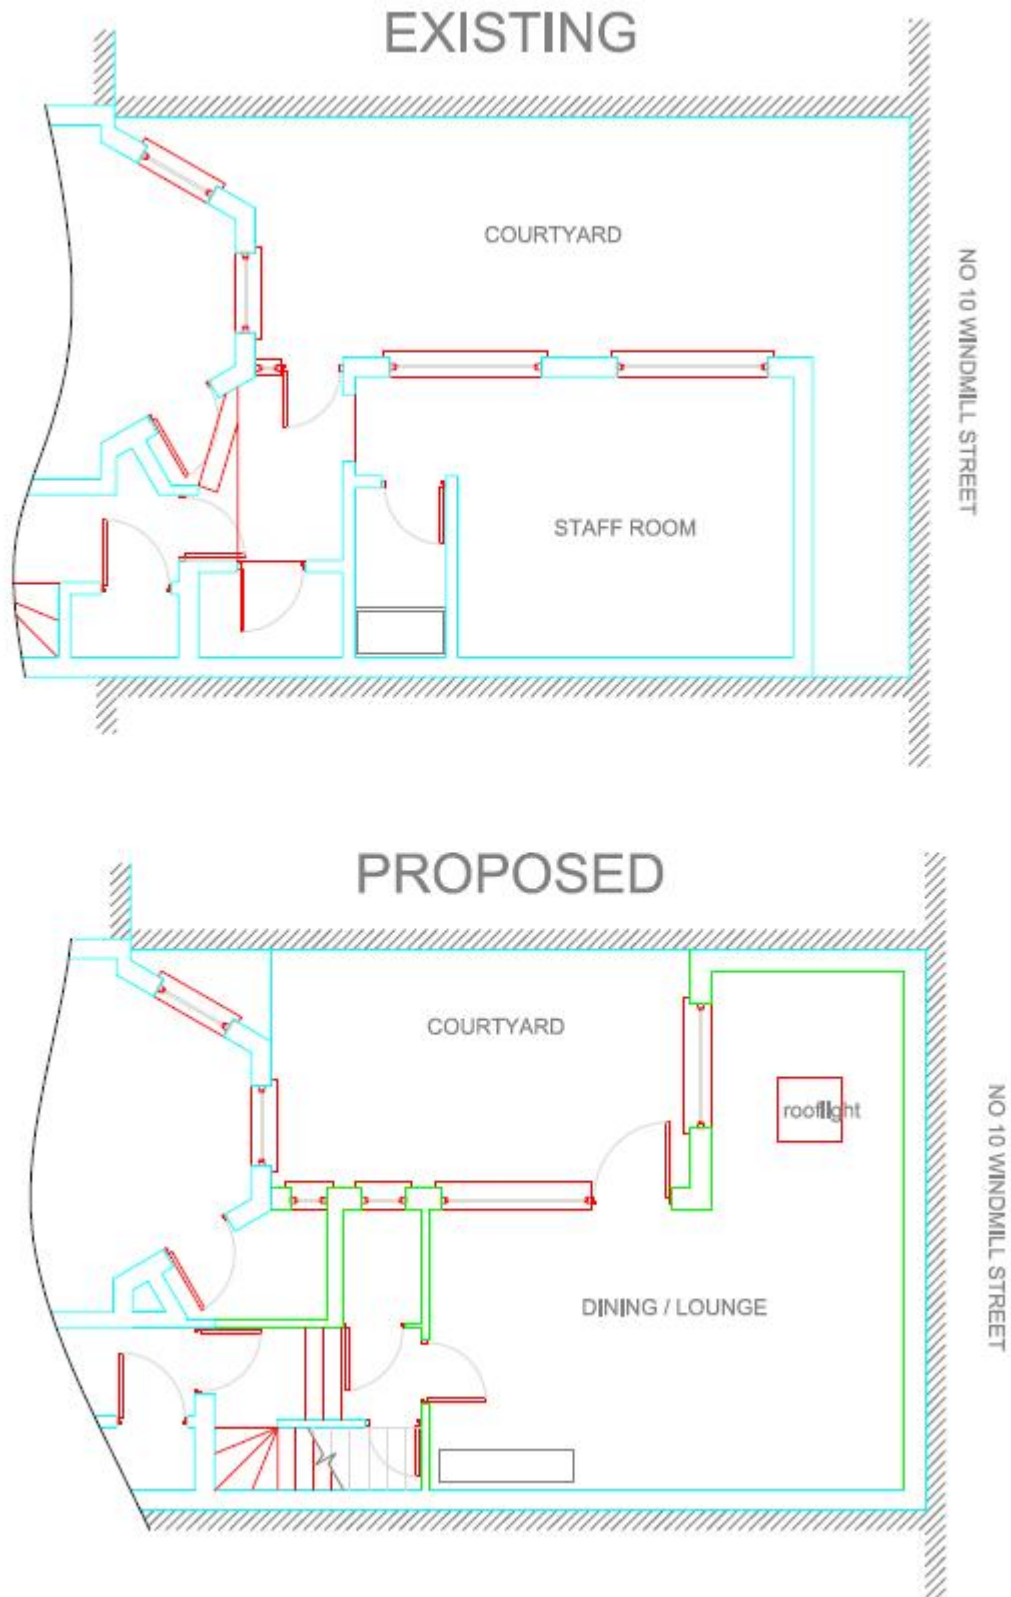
Existing and proposed ground floor layouts (prepared by GGC Design Ltd, drawing 31 PS/P/04 and 31 PS/P/05)
